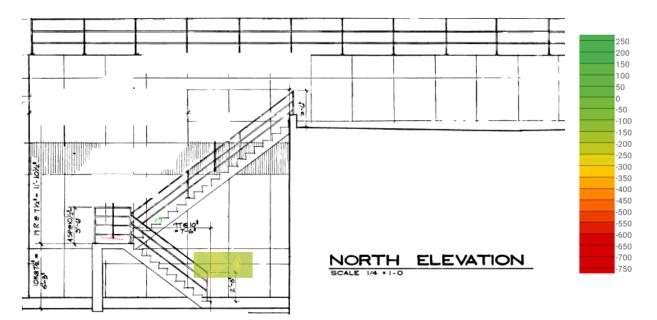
Isolated transverse cracking aligning with guardrail post embeds for the catwalks above
